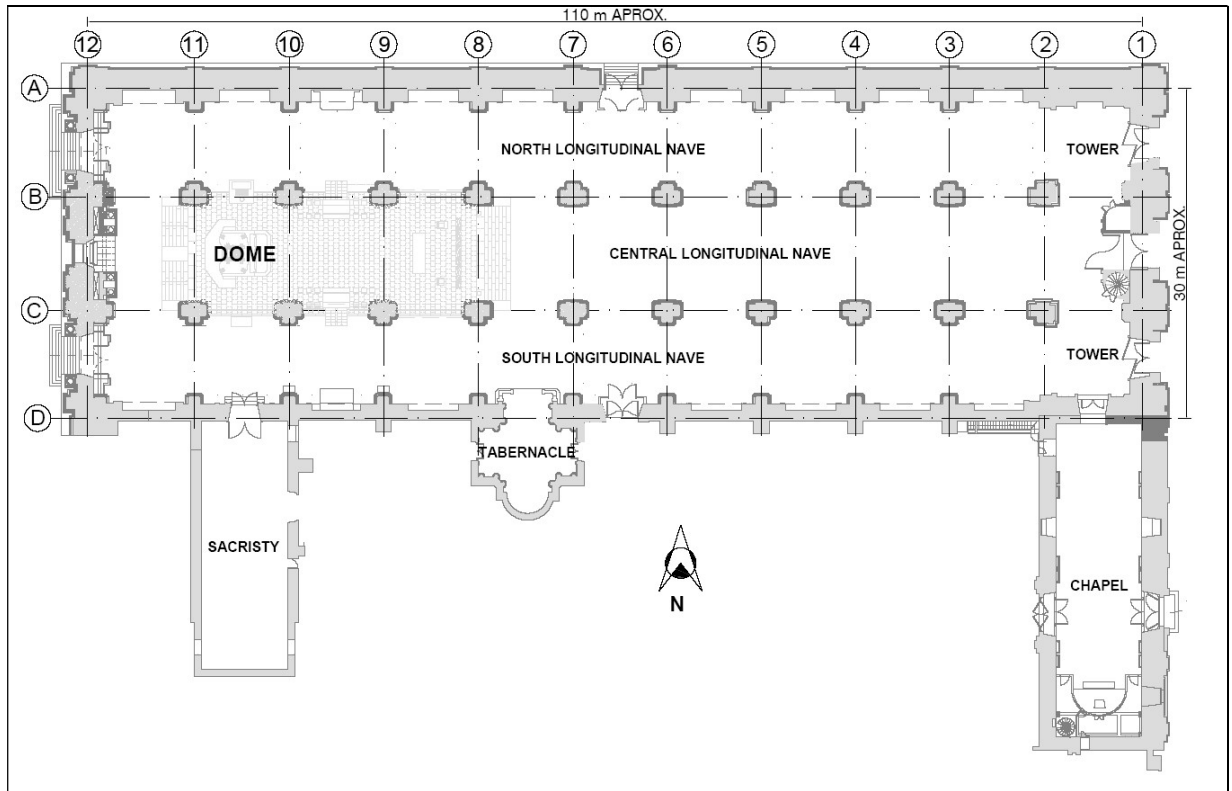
General plan view of the Metropolitan Cathedral of Santiago, Chile.
